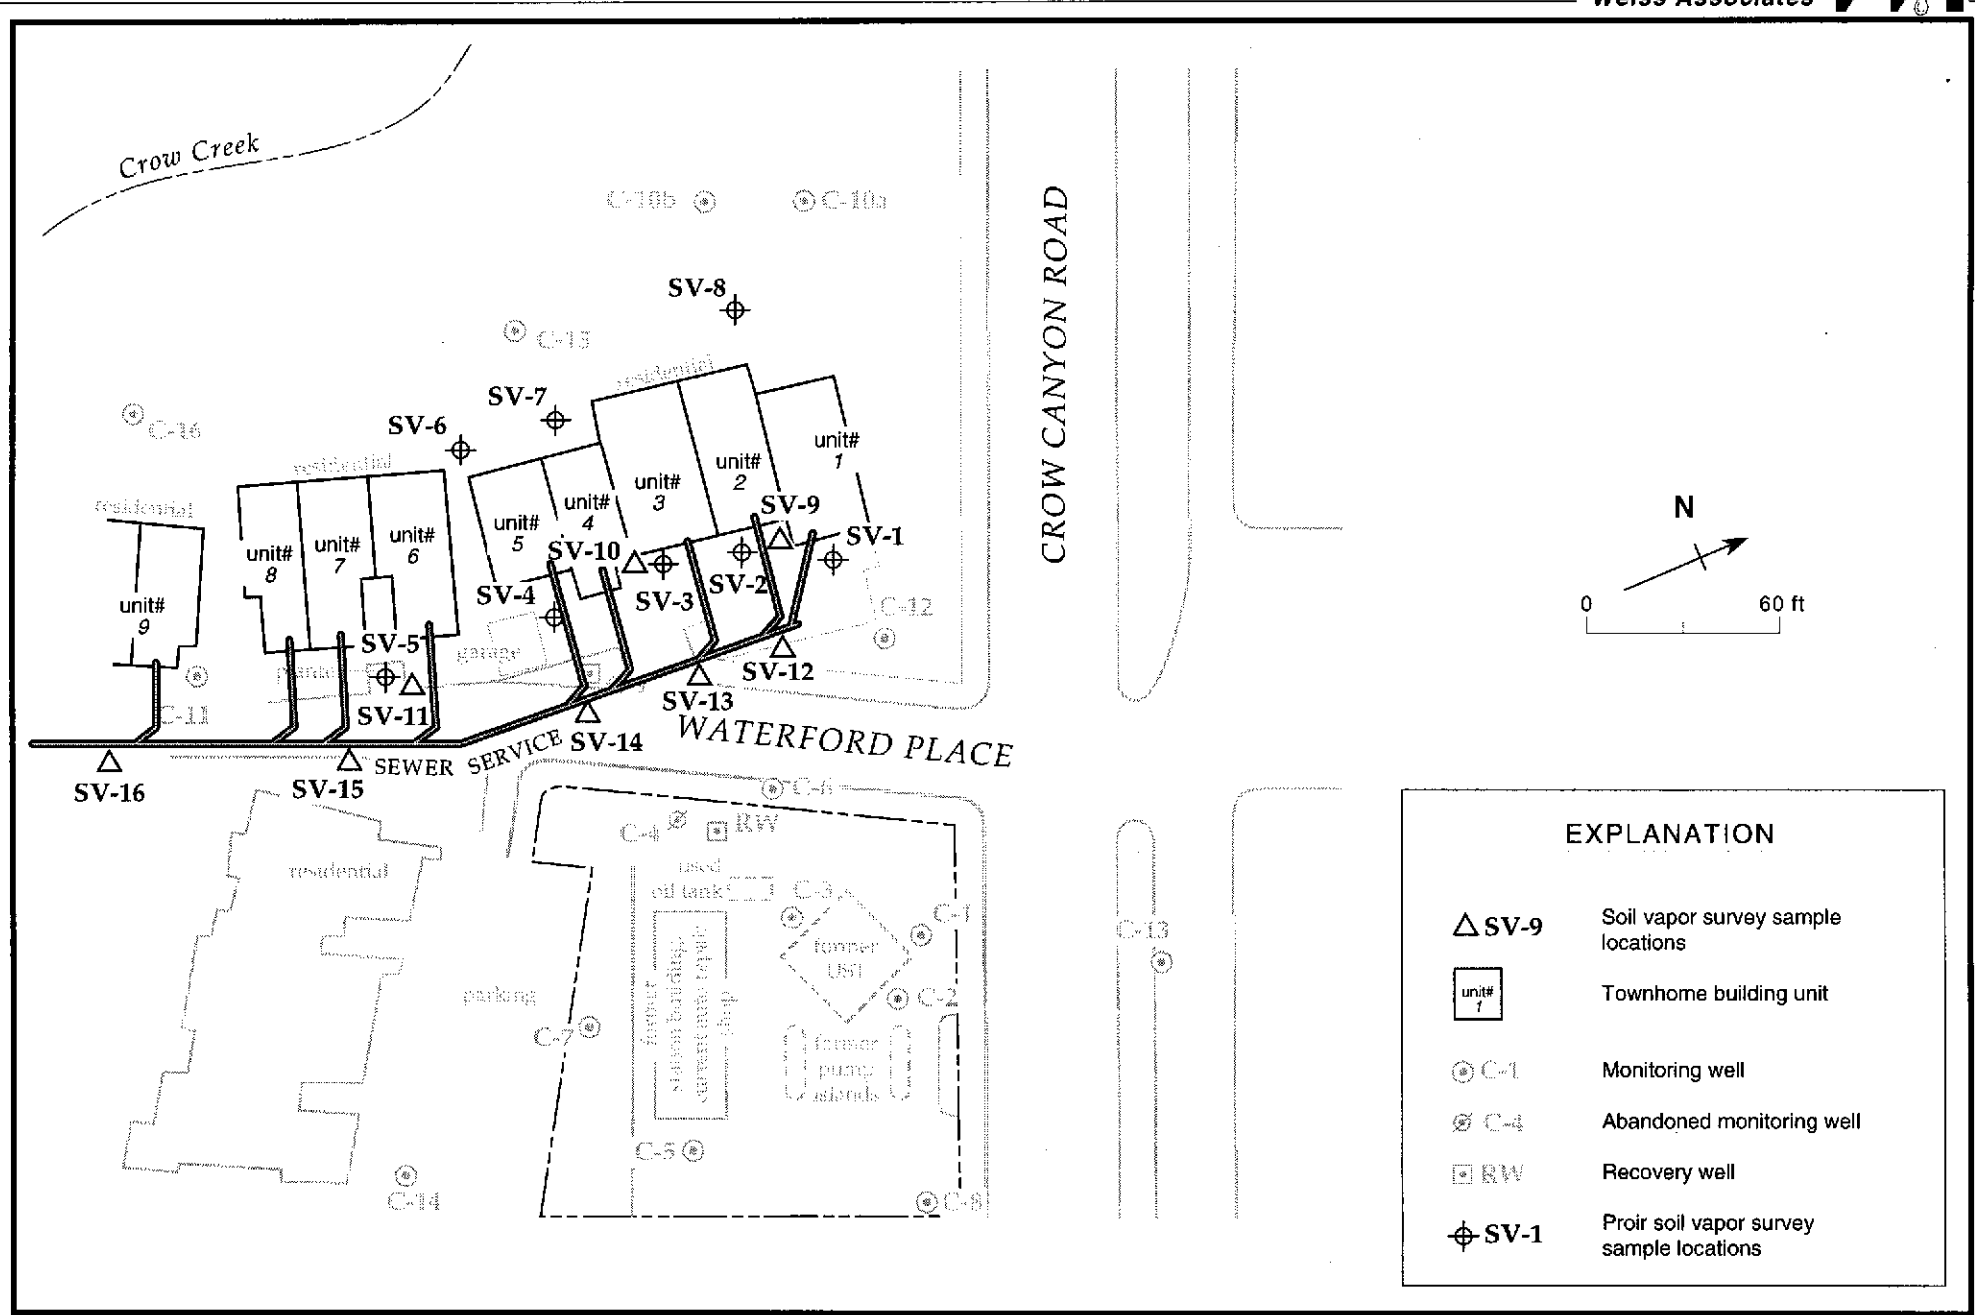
Plan View of Sewer Service Conduits and Soil Vapor Survey Sample Locations- Chevron Station 9-5607, 5269 Crow Canyon Road, Castro Valley, California
